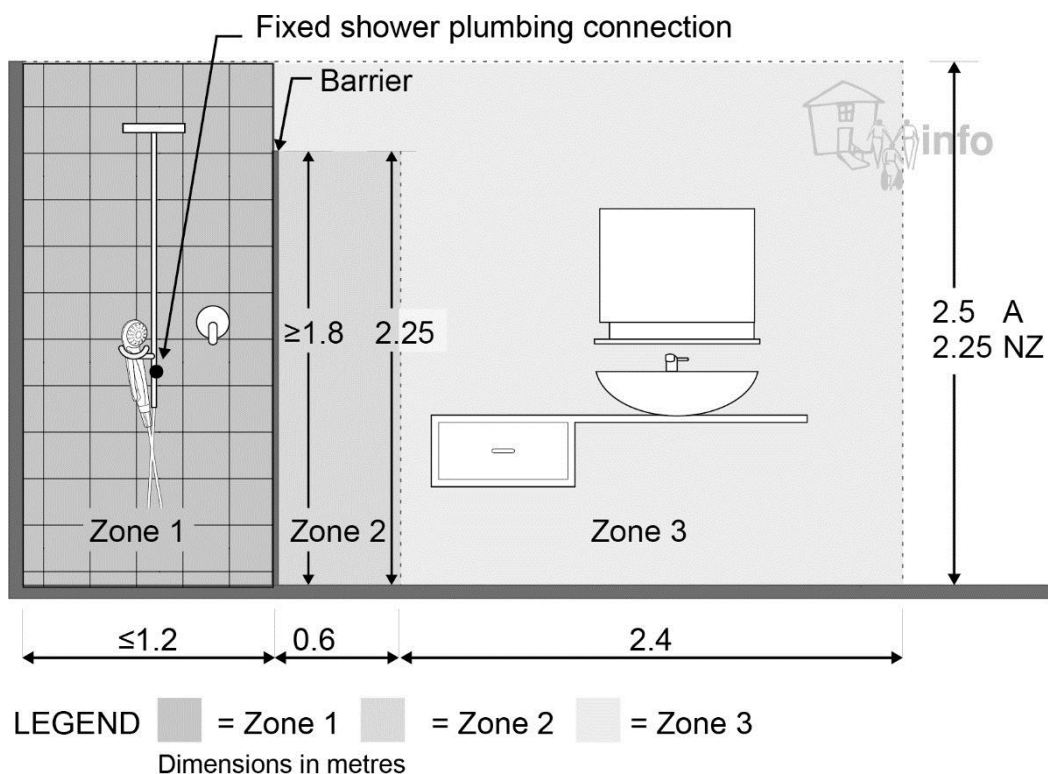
Bathroom Zones – Open Plan Shower: Effect of shower barrier on bathroom zones, elevation view
